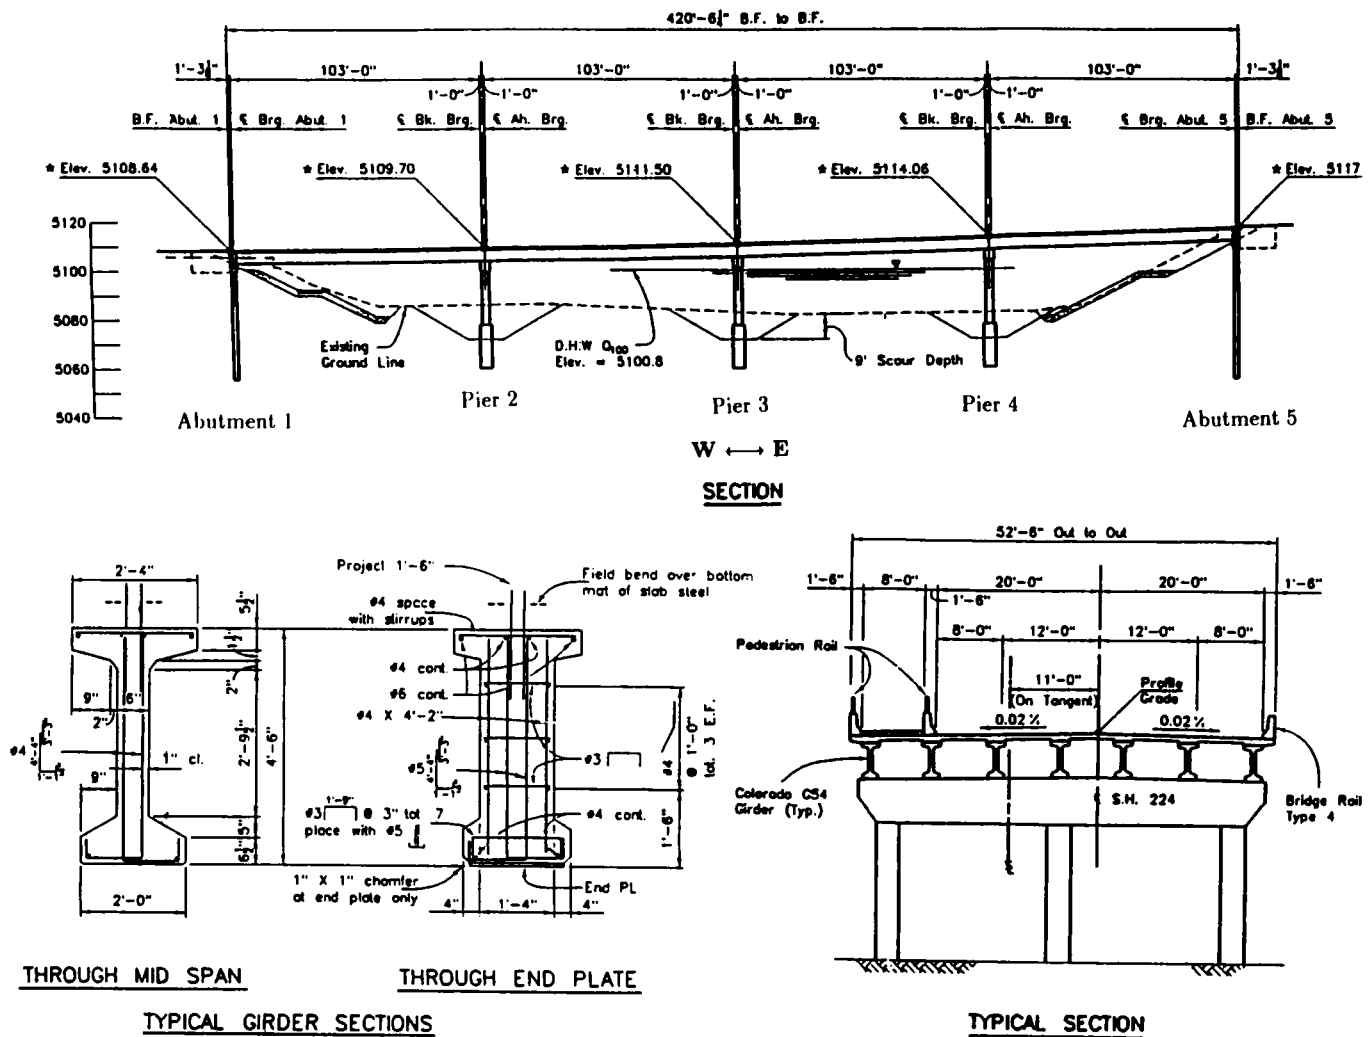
Configuration of the bridge deck (1 in. = 25.4 mm).
